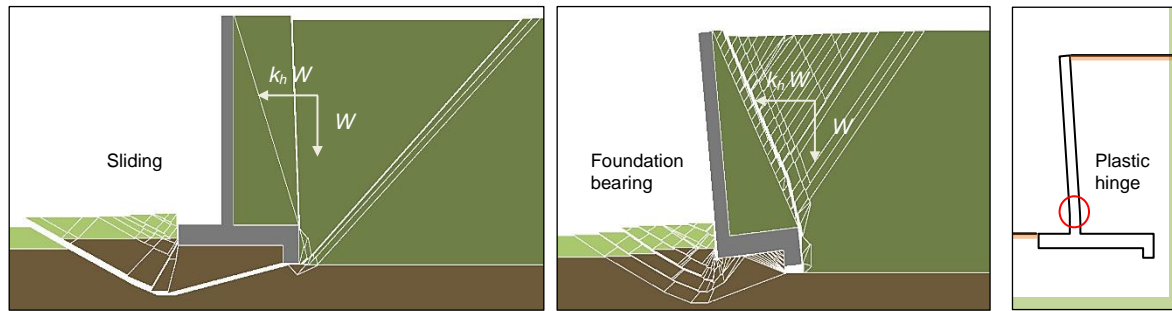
Failure modes reinforced concrete cantilever wall.
